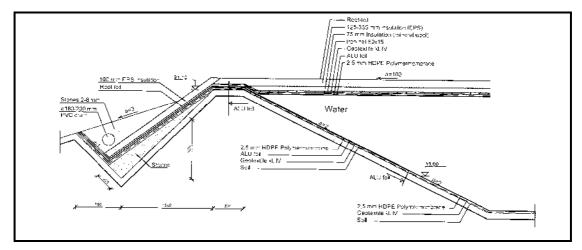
Cross section of the edge of the pit storage in SUNSTORE 2.
